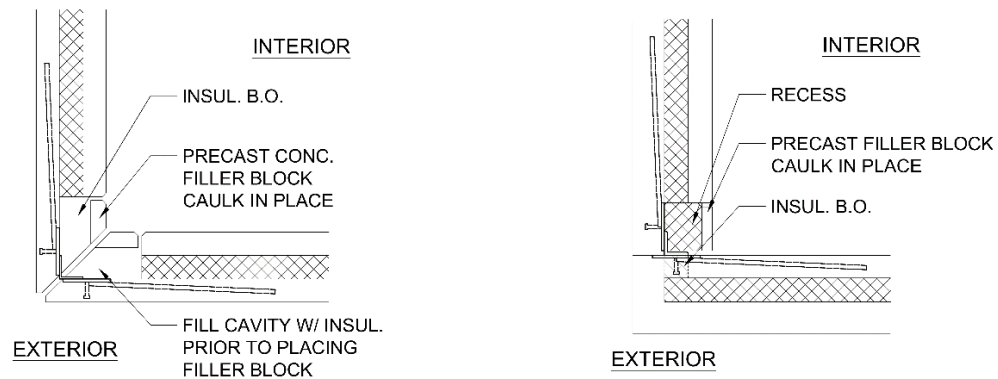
Sample corner details blocking insulation out and replacing after construction
